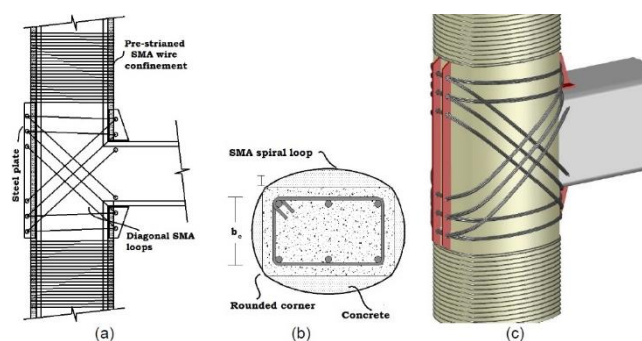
Concrete column-beam joint repaired with SME wires (SUHAIL et al., 2015)
